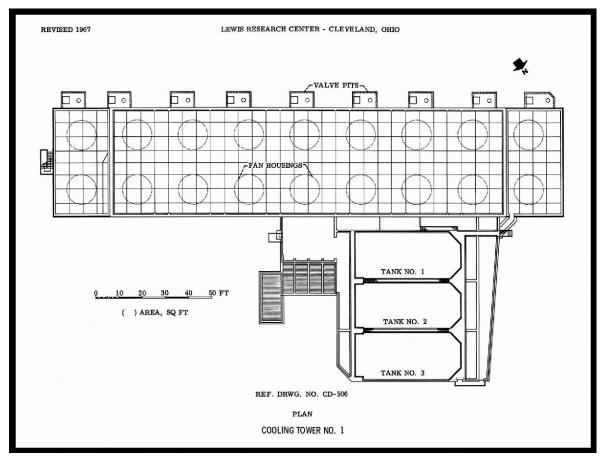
Cooling Tower No. 1 plan, revised 1967 (OH_Cuyahoga_AWT-Support_074).
